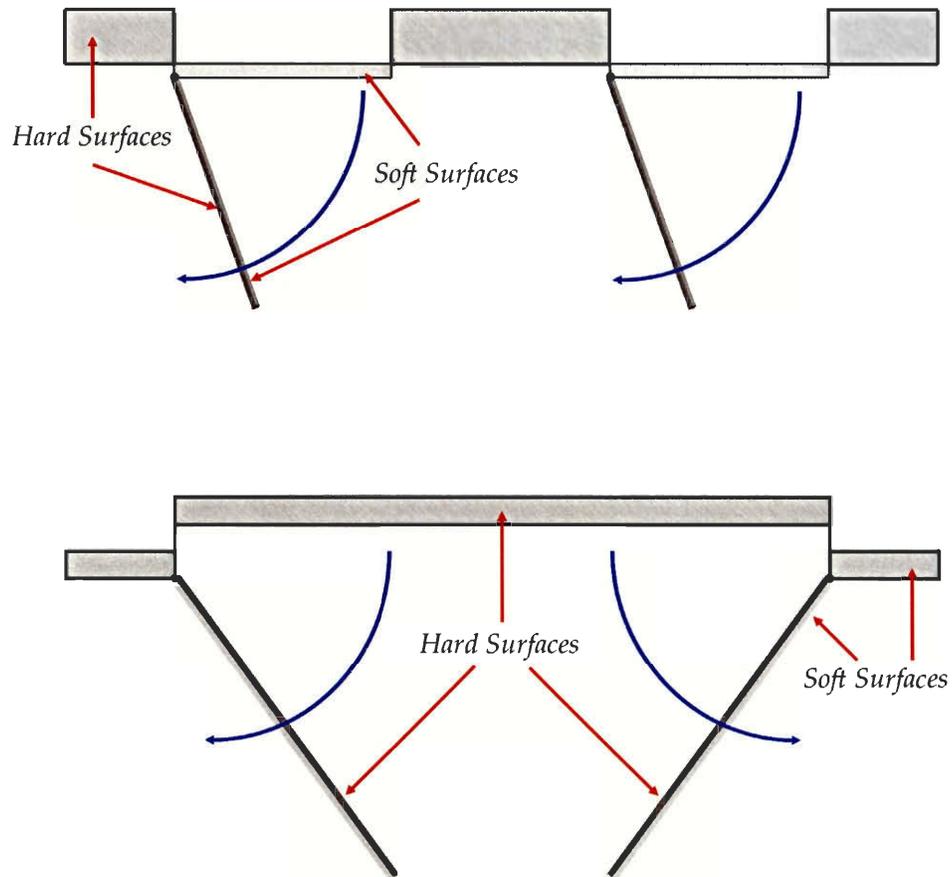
Hinged Wall Panels<sup>18</sup>
